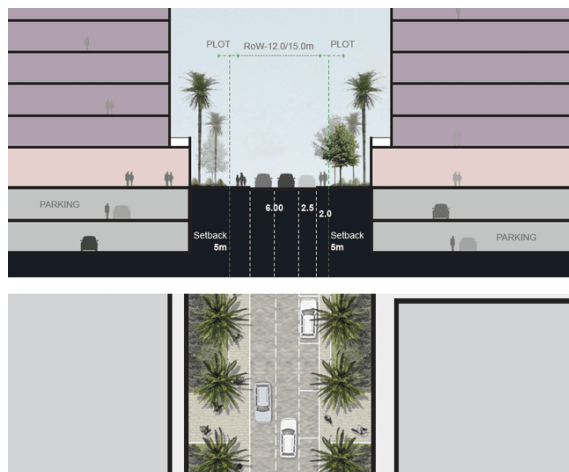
Local road cross-section (12m/15m) (Source: LREDC 2016)
